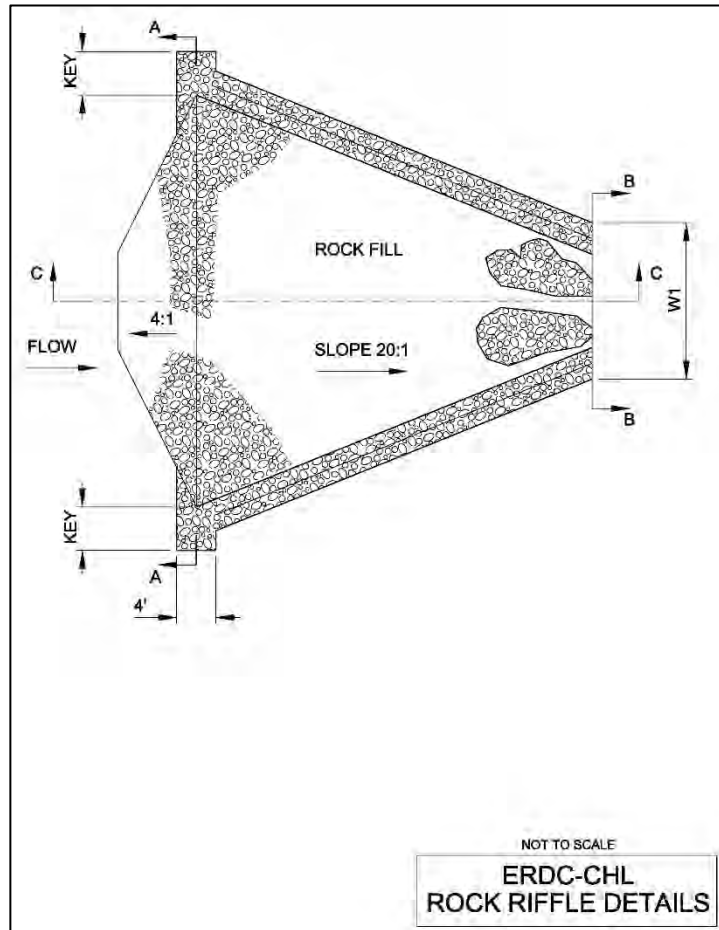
Typical Loose Rock Riffle Grade Control Design Plans
